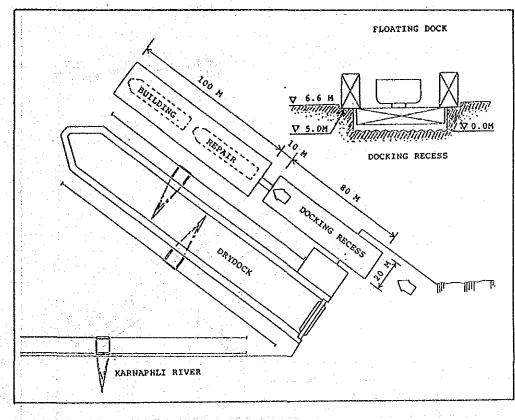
Floating Dock System ( PLAN "B" )
